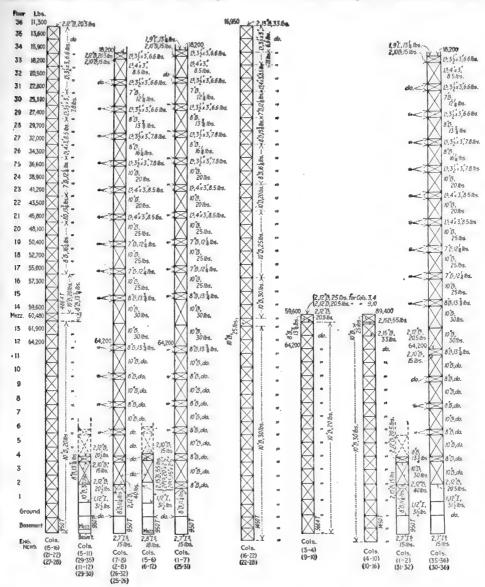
DIAGRAM OF WIND BRACING, SINGER BUILDING.
